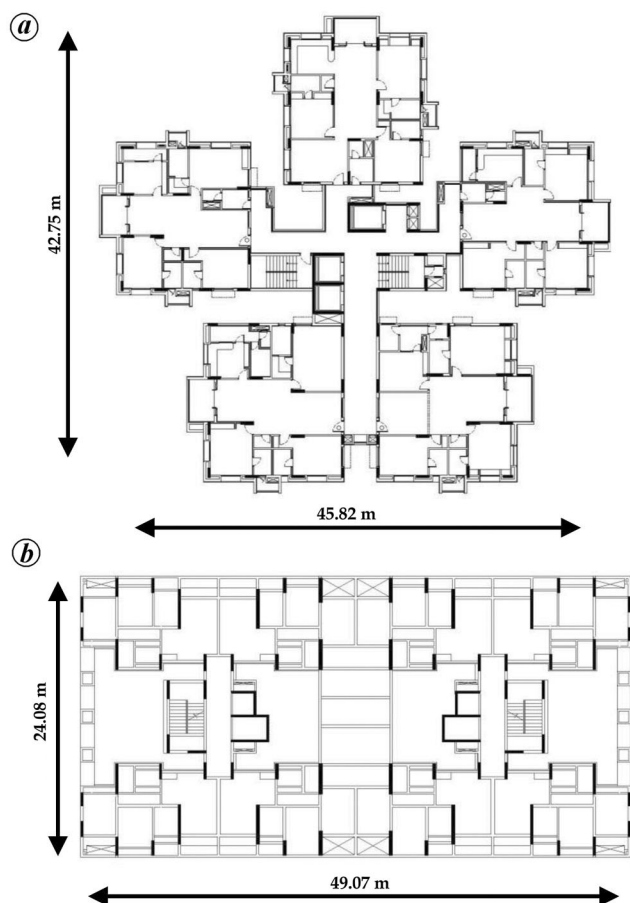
Sample plans of the buildings surveyed. a, HYB39; b, MUM01.
